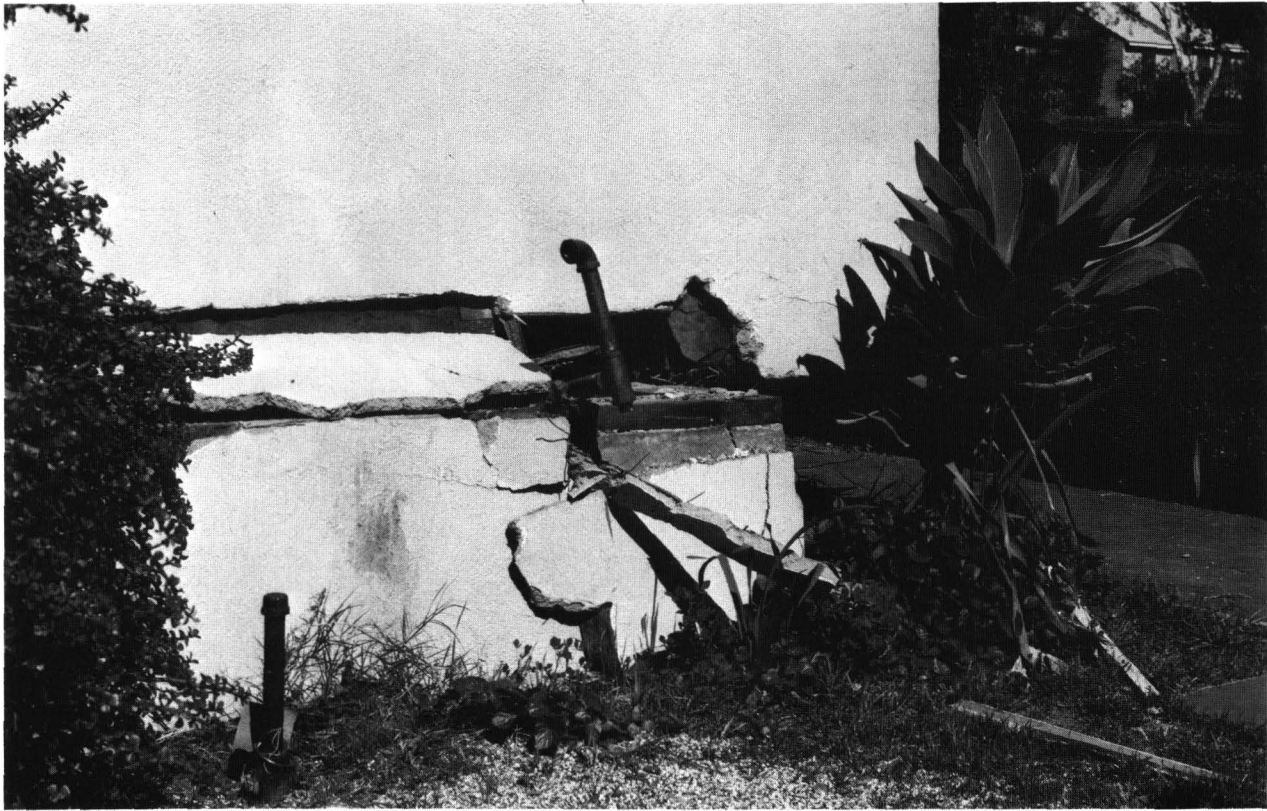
Dwelling in the vicinity of Cometa and Fernmont, San Fernando. Building was shaken off foundation and moved 2 feet forward. Los Angeles City Department of Building and Safety photograph.
